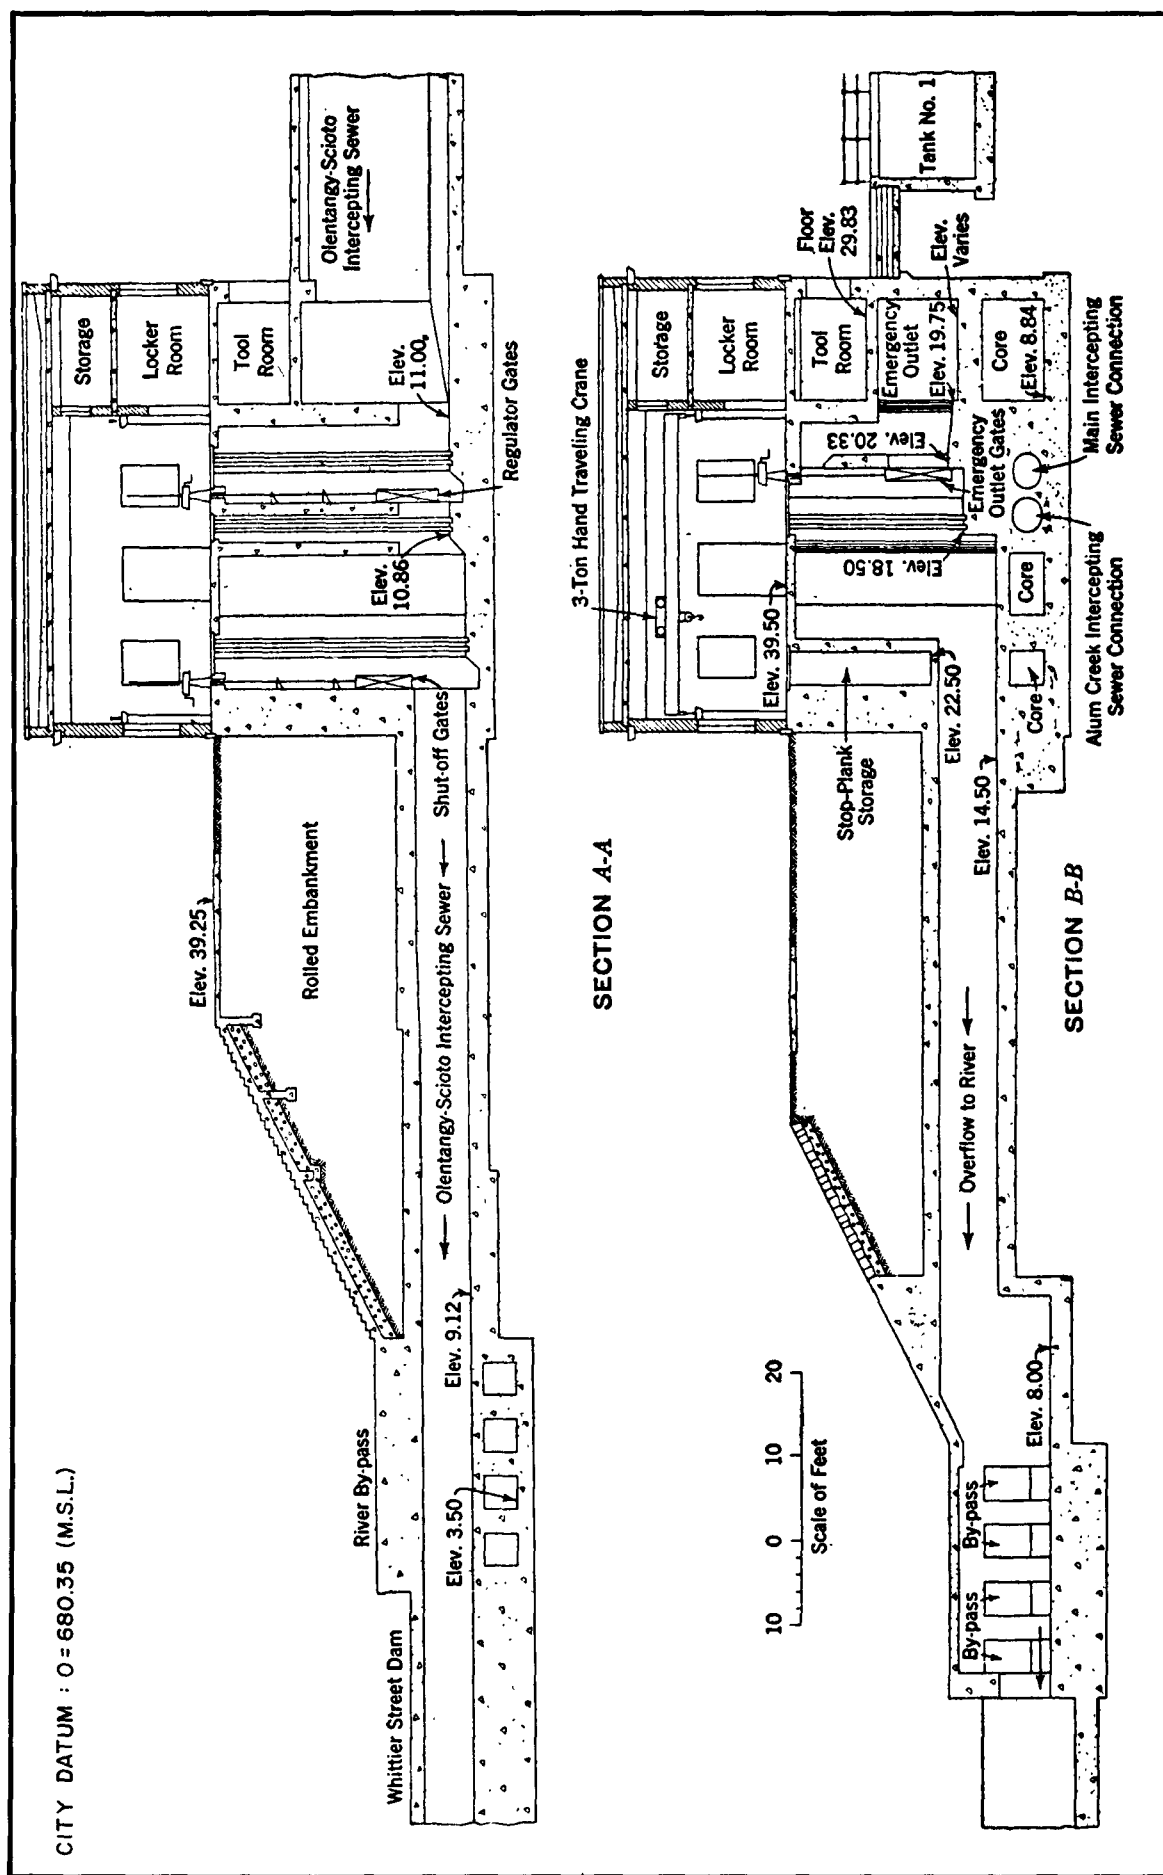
SECTIONAL PLAN THROUGH SUBSTRUCTURES IN VICINITY OF CONTROL HOUSE
